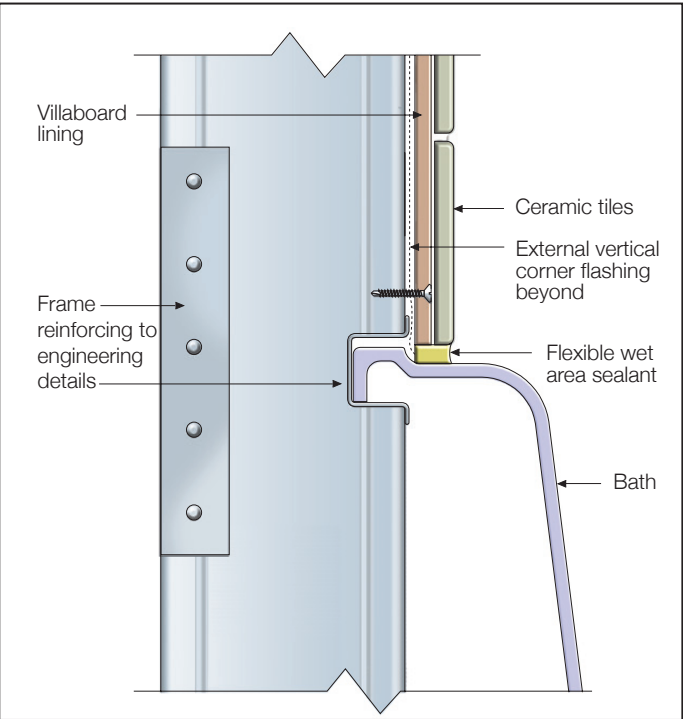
B BATH EDGE DETAIL - VILLABOARD LINING TO BE FINISHED WITH TILES - STEEL FRAME
